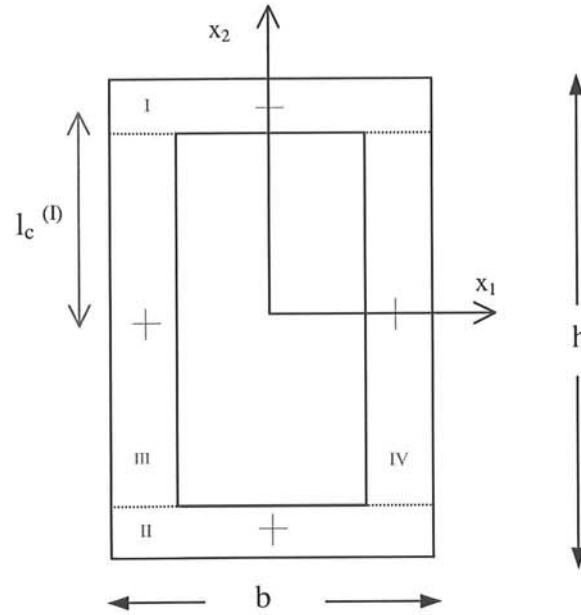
Subsections of a box section used to evaluate its global damaged inertia
